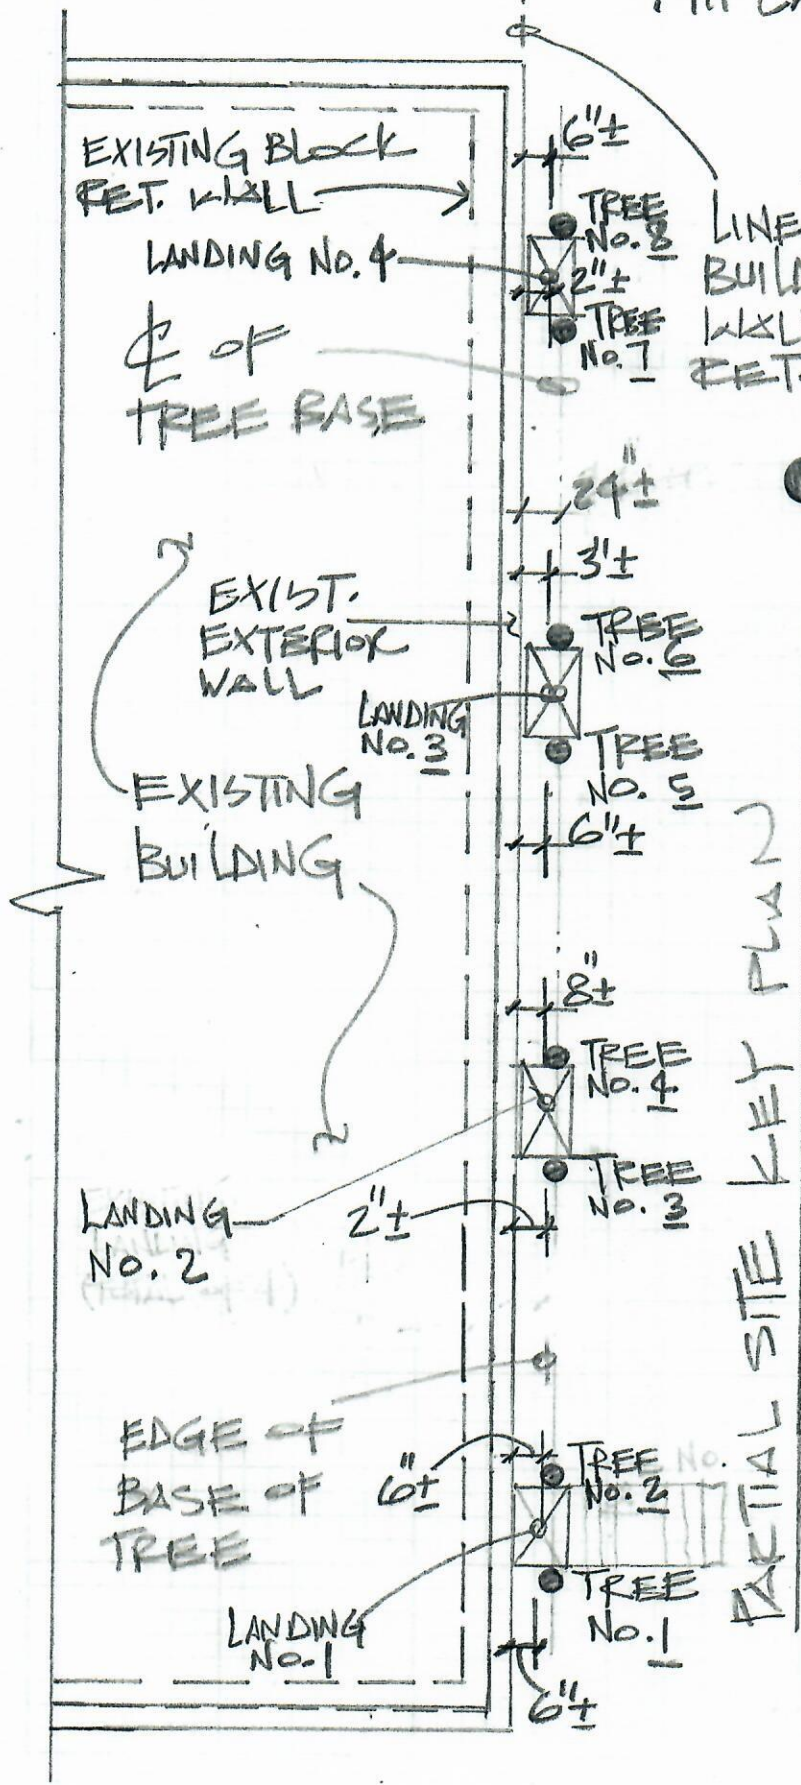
Location of vertical crack at inner face of existing block retaining wall foundation
